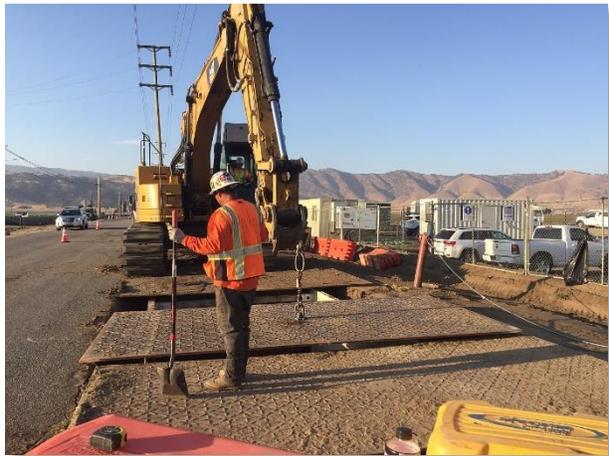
Steel plates were used to cover trench and vault excavations along Pelliser Road outside of the Banducci Substation
